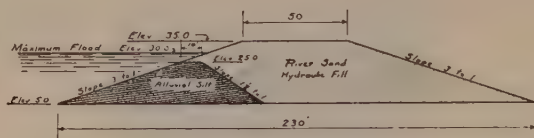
TYPICAL CROSS SECTION OF PROPOSED DIKE, MODEL No. 1 (SCALE OF MODEL 1:15)
